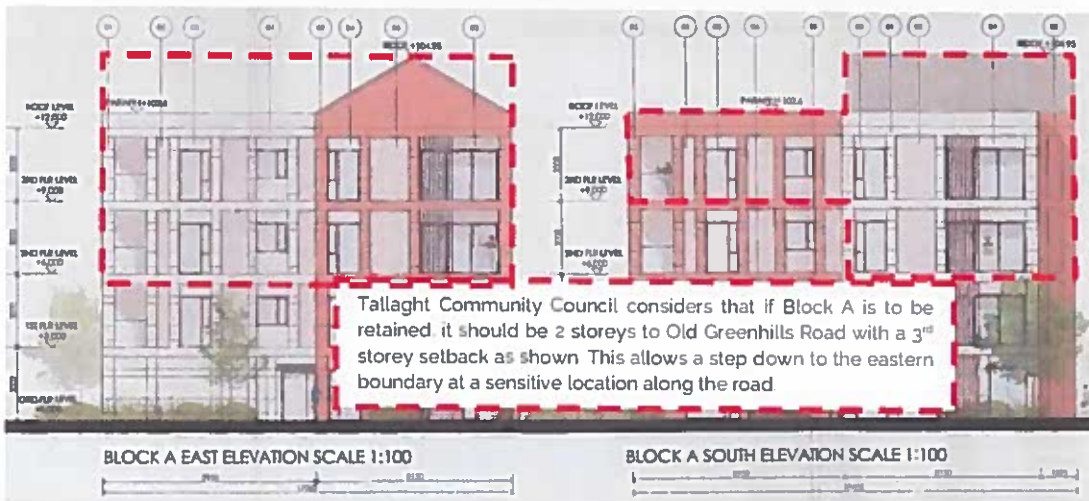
Block A's south and east elevations to adjoin Old Greenhills Road and The Priory's entrance/driveway
